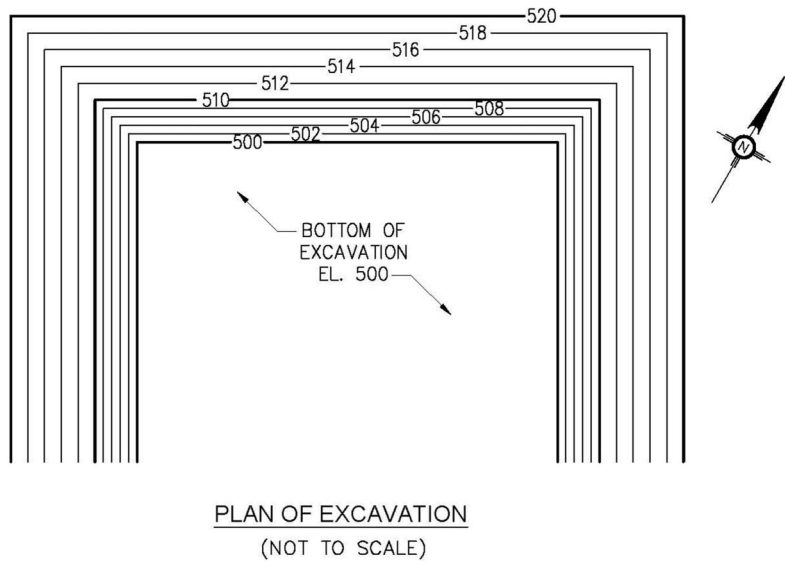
S-2. Plan of Excavation Showing Topographic Contours
